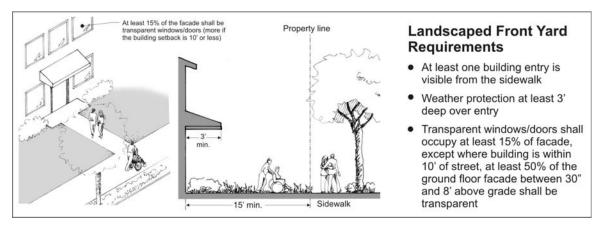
(C)(3). Landscaped yard standards and examples.
